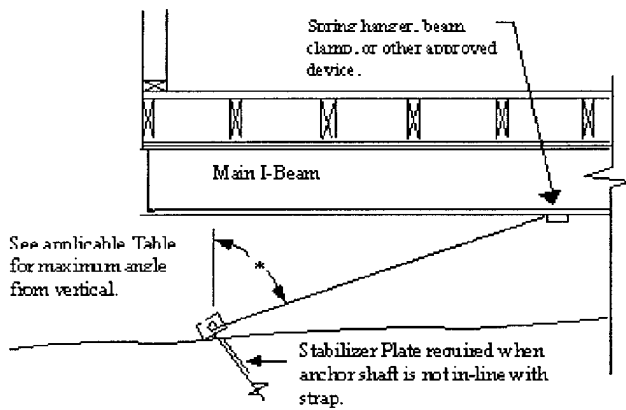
Connection to existing spring hangers, factory installed or site installed beam clamps.
